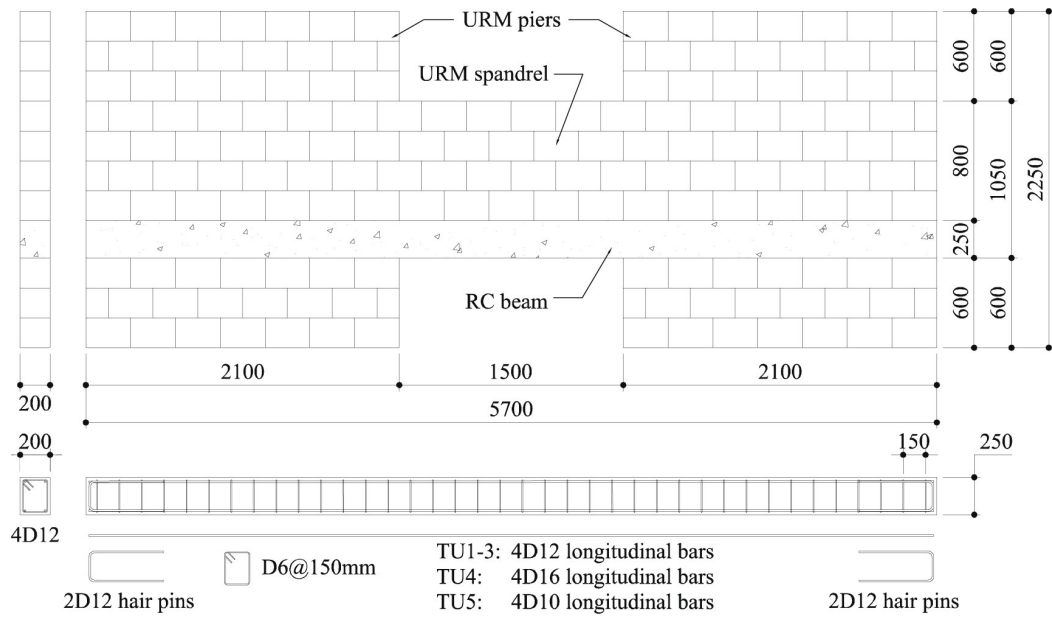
Geometry test units and reinforcement layout of the RC beams (from [BD12] p.5)
